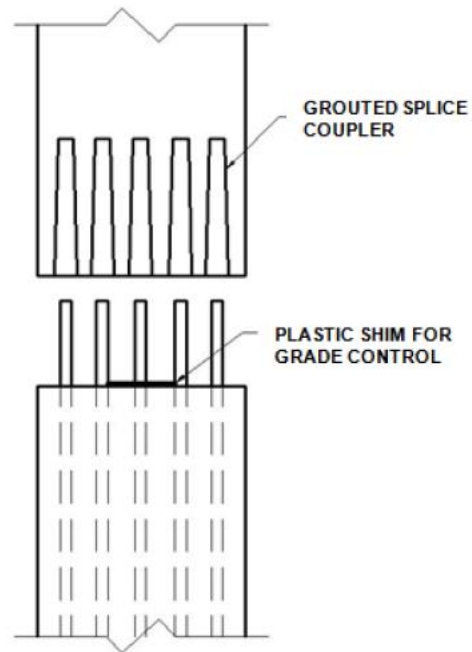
Column splice with grouted splice coupler (FHWA 2009)
